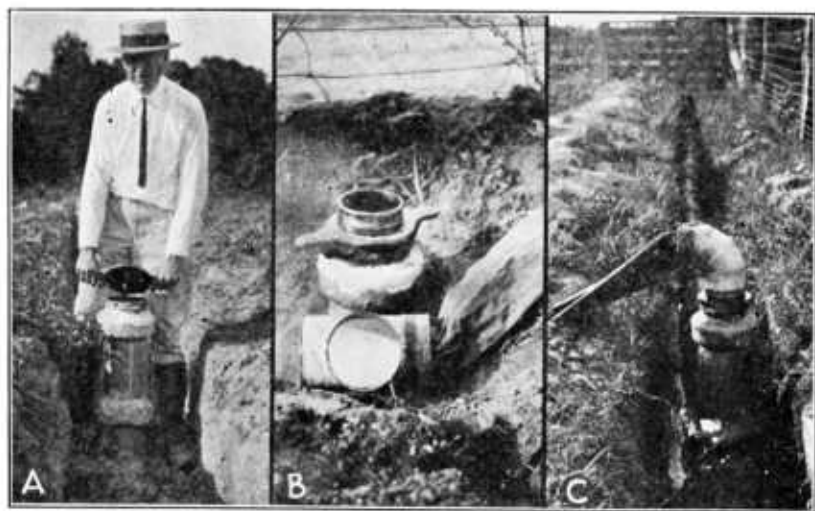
Recent design of irrigation valve for terra-cotta pipe system, showing valve, both closed and open, and short riser pipe connecting the valve with the underground main
